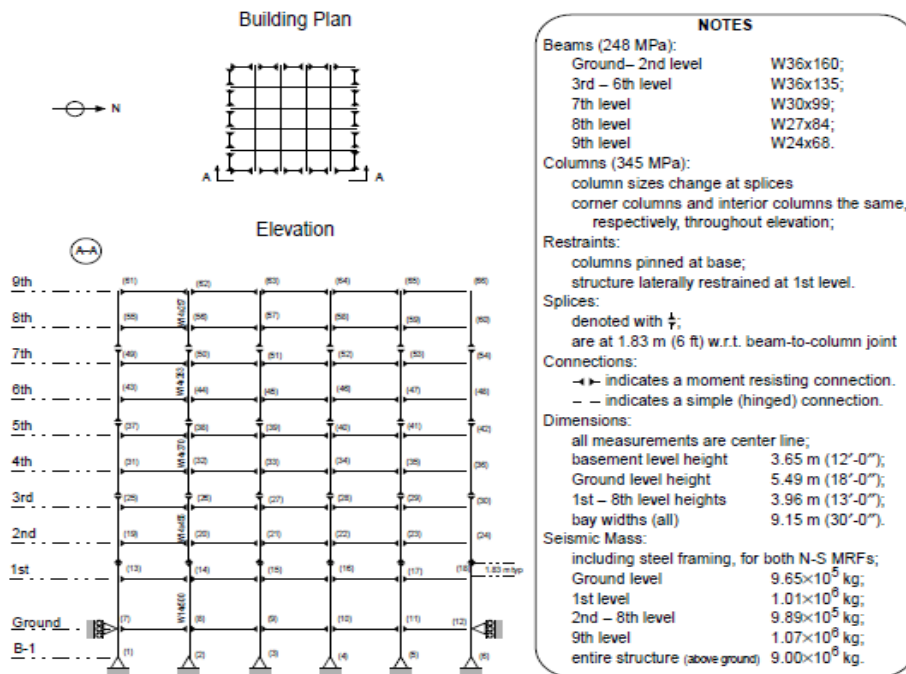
Nine-storey building (adapted from Ohtori etc. (2000)).
